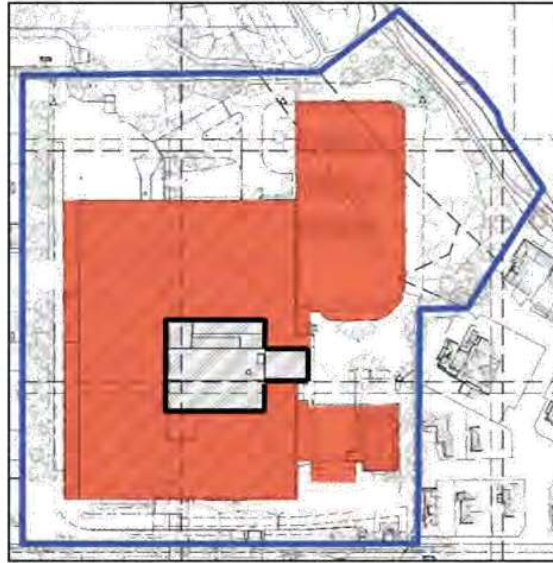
Plan of the existing site, the Former Bushells Factory Building core is outlined in black. (Source: Colliers International)
